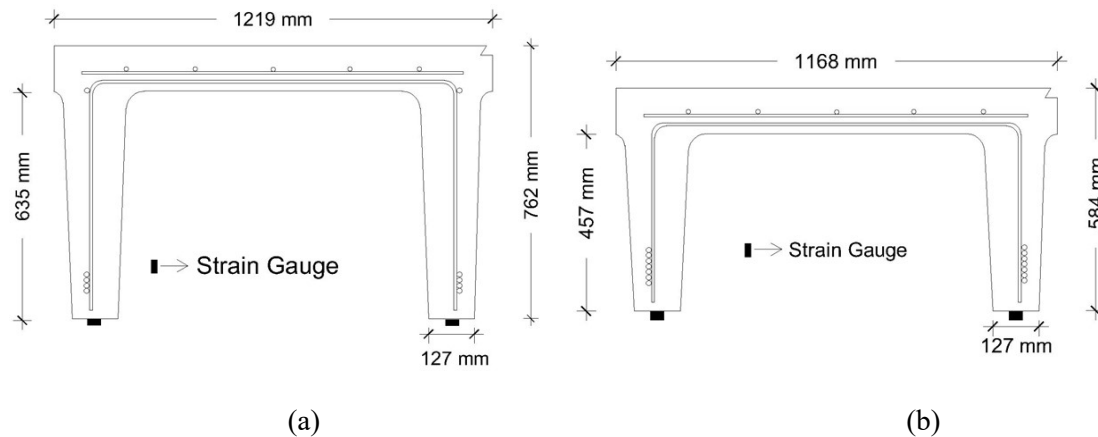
Location of strain gauges on both bridges tested (Kidd et al. 2021): (a) Bridge A with 762-mm-deep DT girders and (b) Bridge B with 584-mm-deep DT girders
